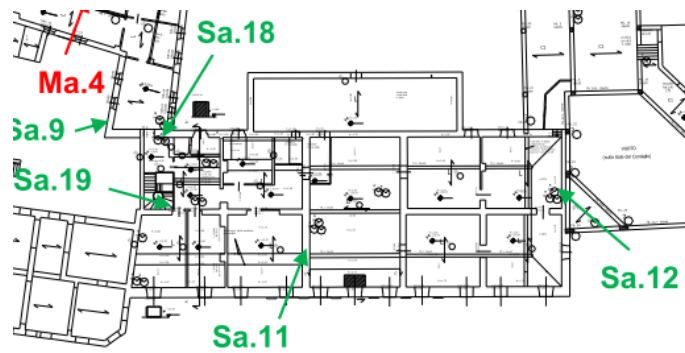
Location of plaster removal (Sa) at the second floor of building A.
